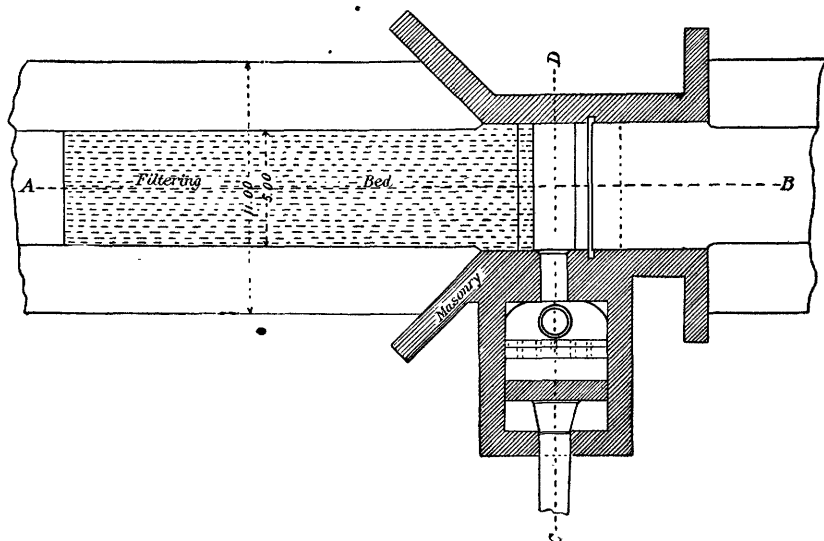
Plan of bulkhead and orchard lateral connection on Gage canal system.
